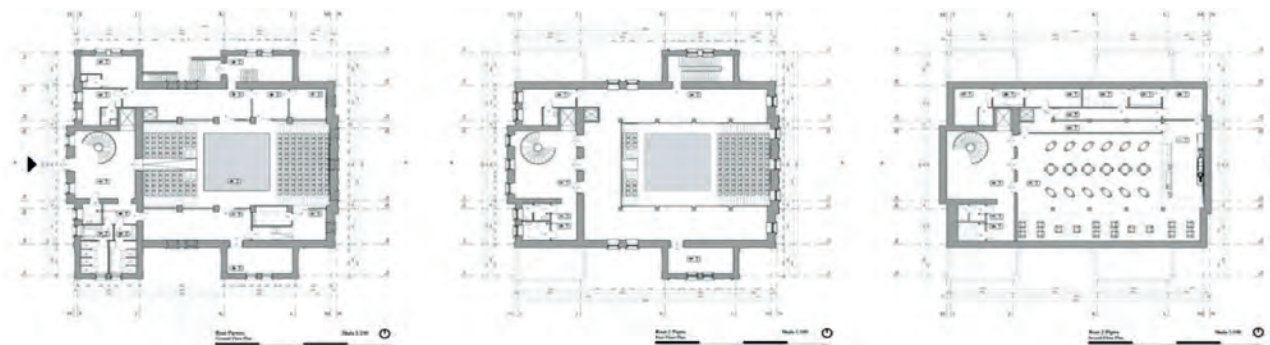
Synagogue in Kielce. Design. Floor plans of the building (ground floor, first floor, second floor) [21]
